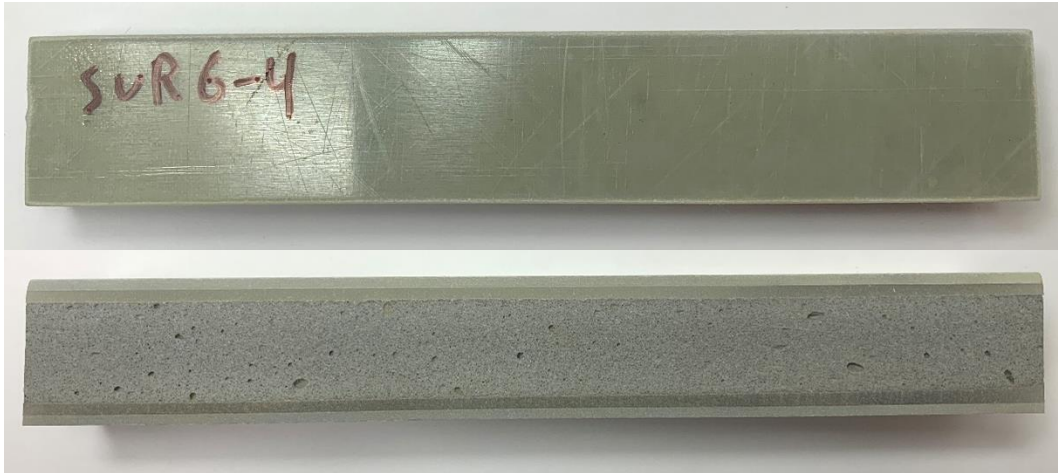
Top and side view of a UHPC thermoplastic-reinforced sandwich beam specimen.
